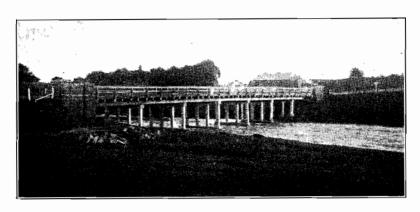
Showing new bridge erected over the Mt. Emu Creek at Panmure on the Prince's Highway.
